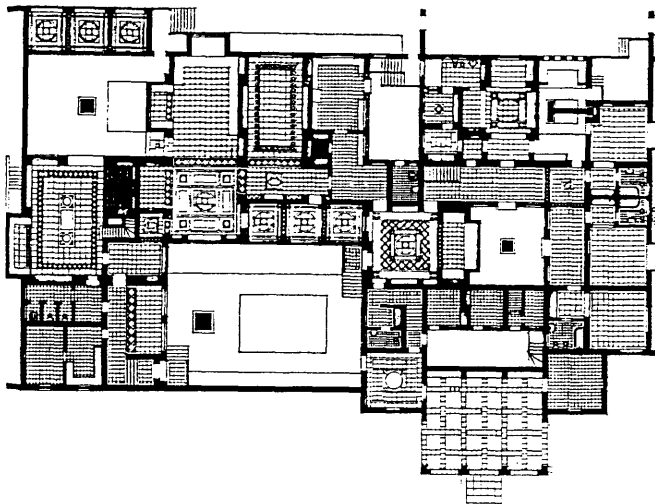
Plan VIP Palace at Tabouk, Saudi Arabia
